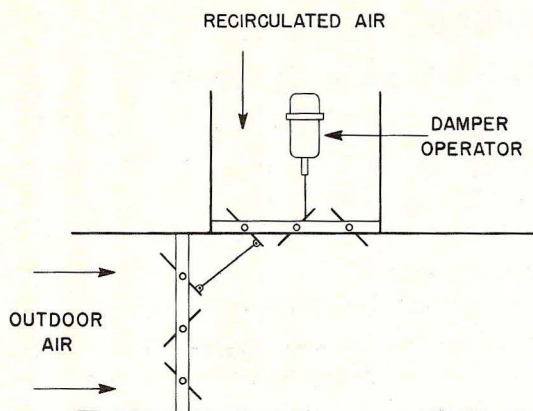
Outdoor and Recirculated Air Mixing Damper Proportioning Type
